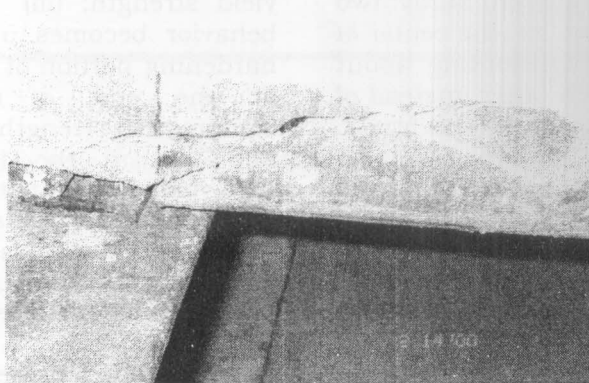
Cracking patterns for tested non-strengthened slab bridge models.
